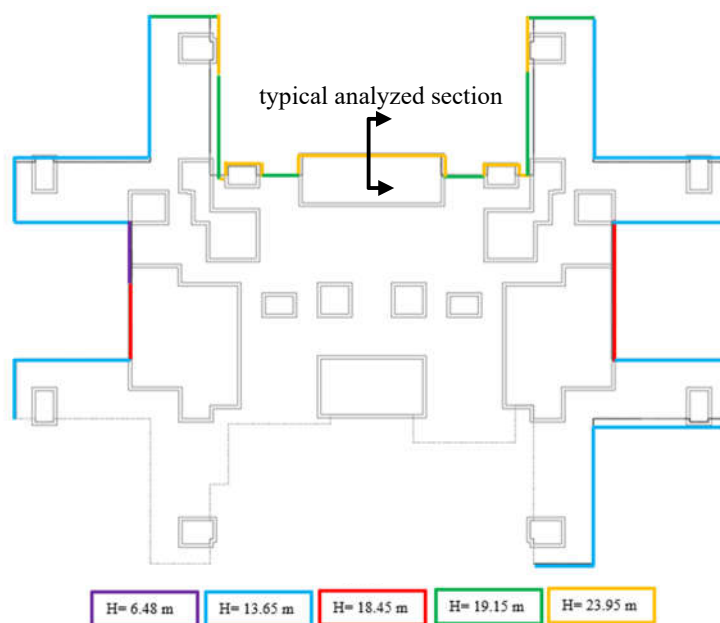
Foundation formwork plan of main hospital and MSE wall layout
